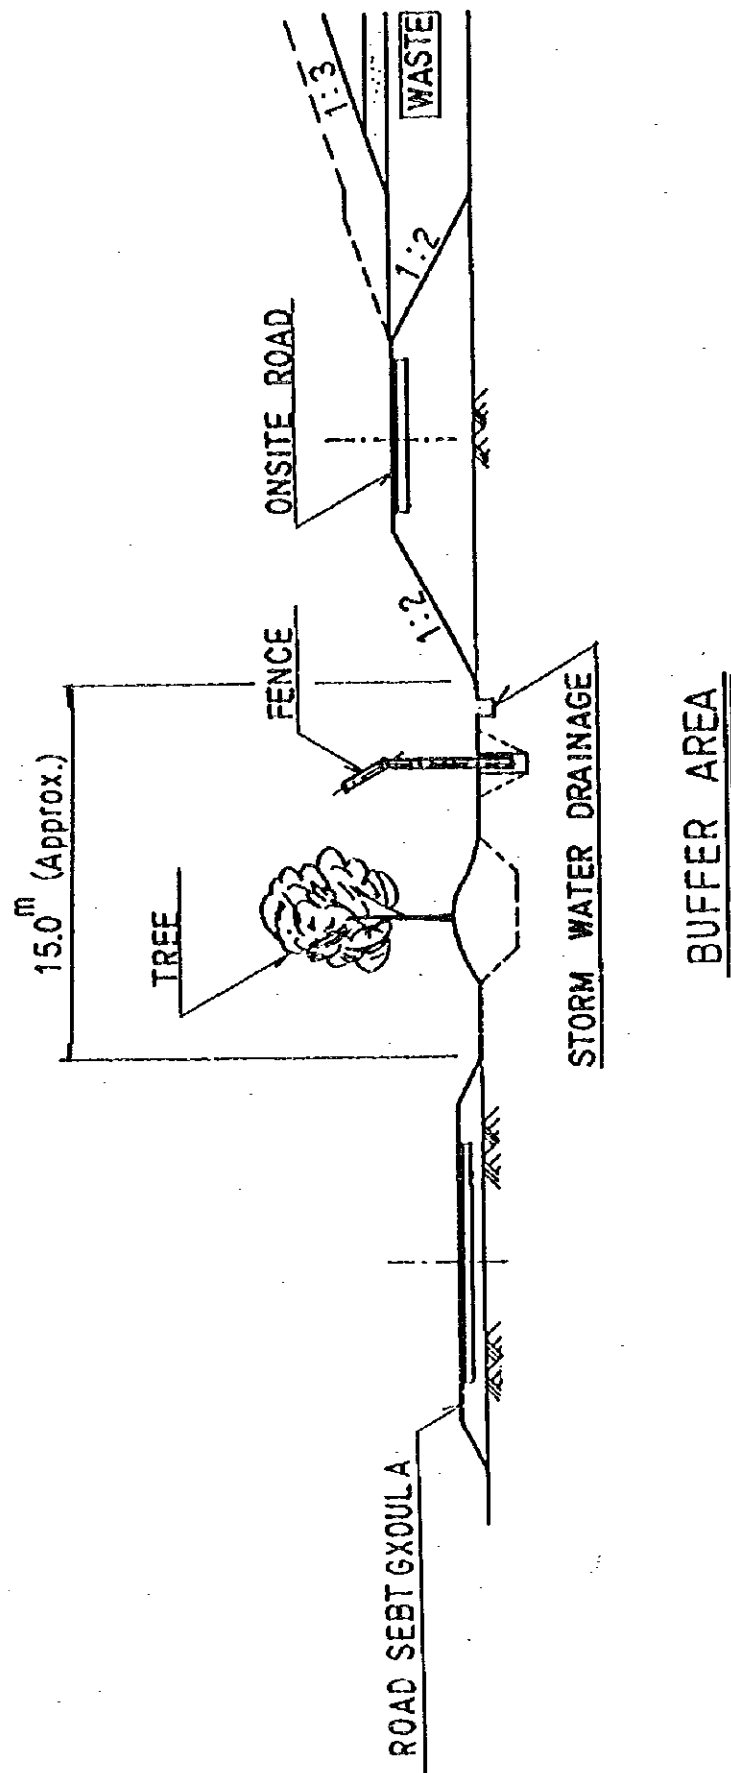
Improvement Plan of Existing Municipal Disposal Site
